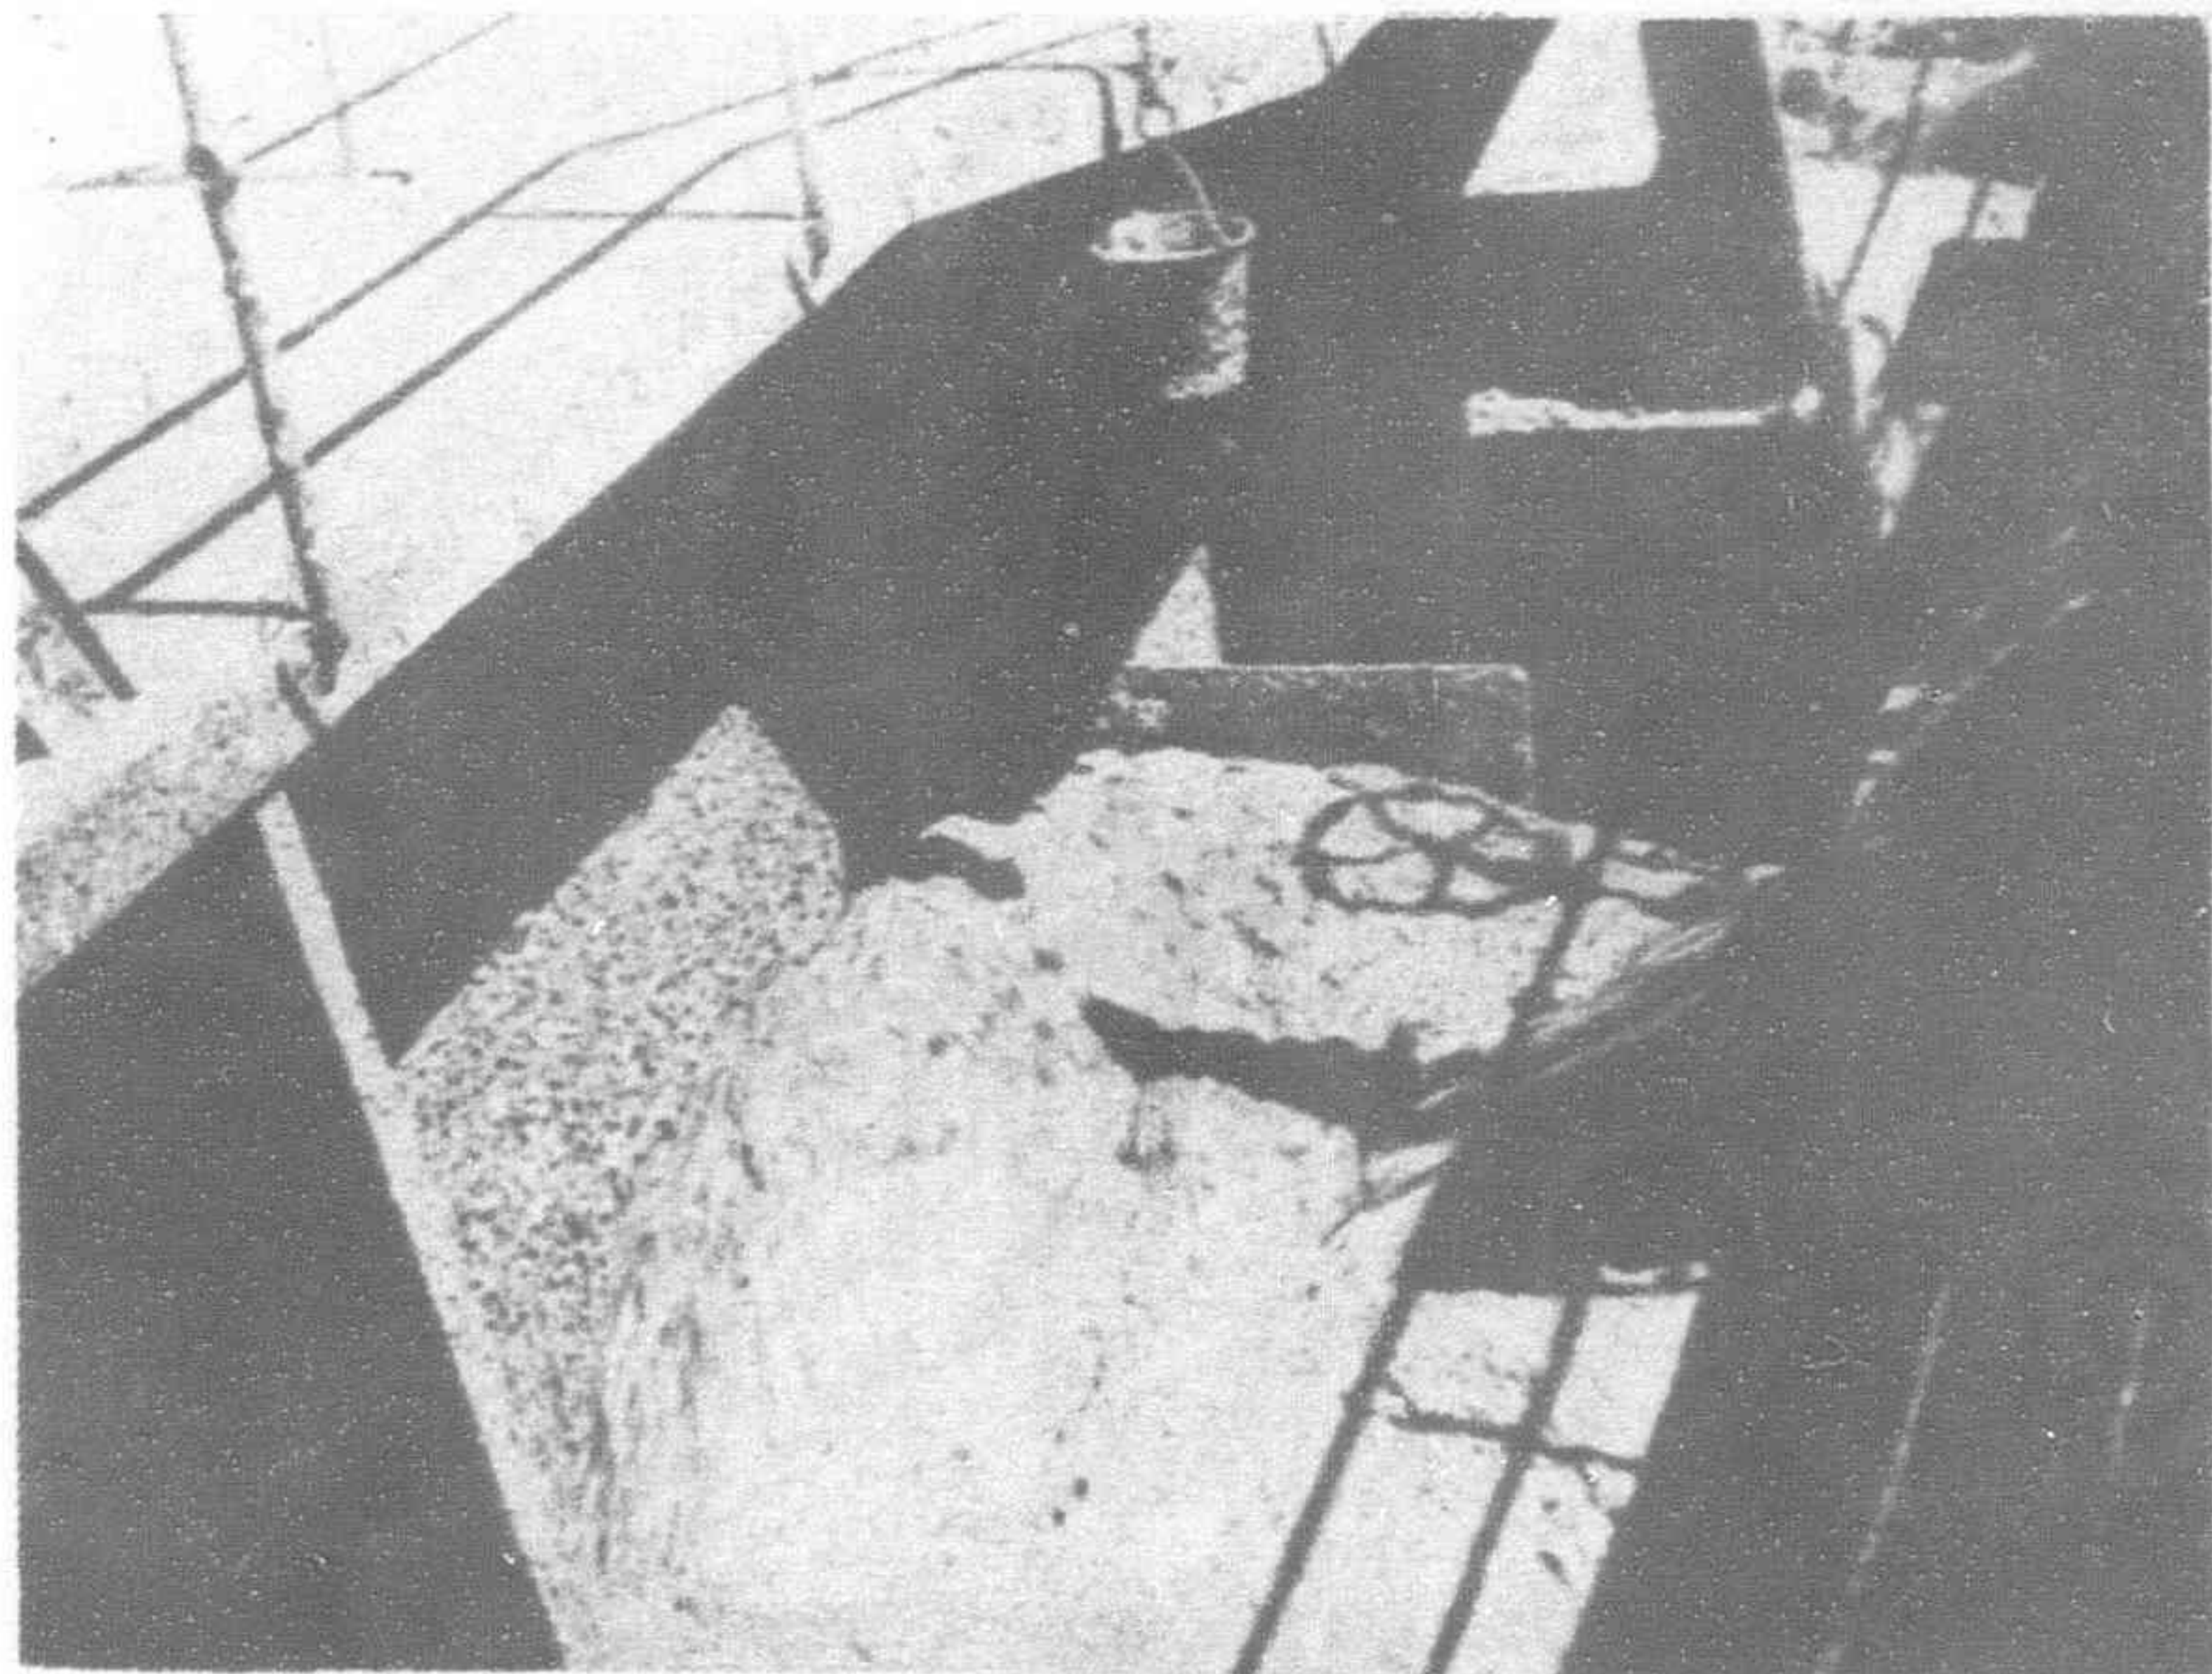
Filling mud to starboard hoppers through distributor outlets
